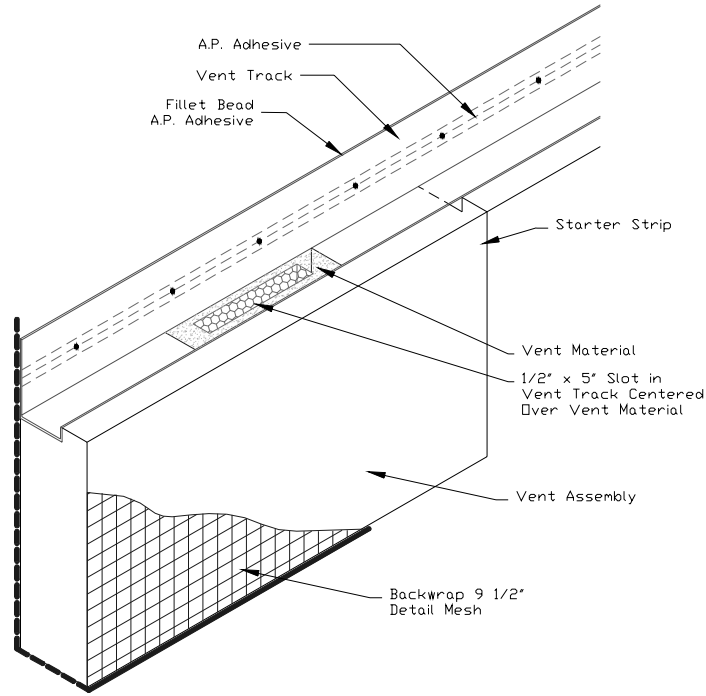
VENT TRACK AND VENT ASSEMBLY INSTALLATION DETAILS
